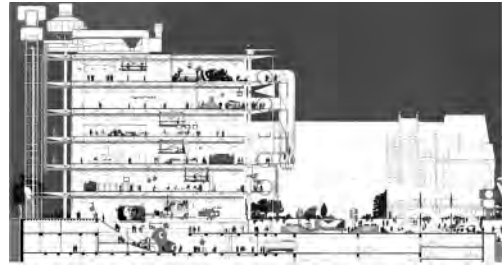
Piano+Rogers Architects and Ove Arup & Partners, Centre Beaubourg, Final Design, main section, Spring 1973 (Renzo Piano Foundation, Genoa).
